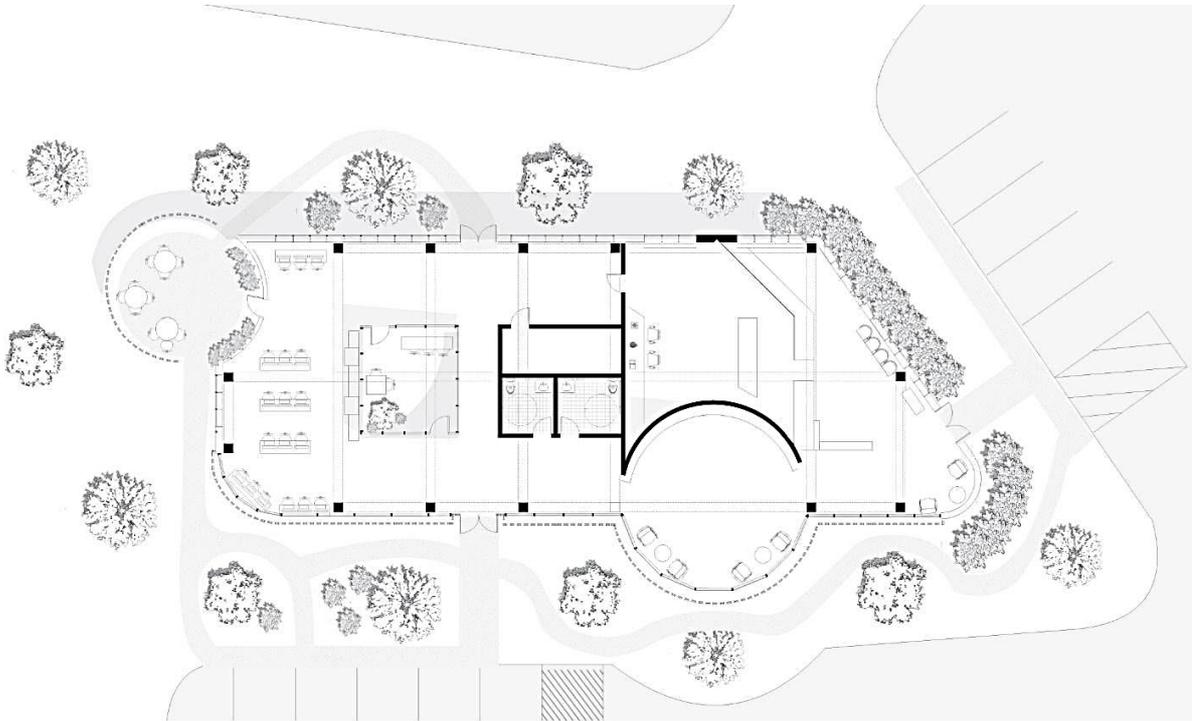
Building plan drawing of post office design project in Shiprock, NM, Navajo Nation, by Courteney Begay, 2021.
